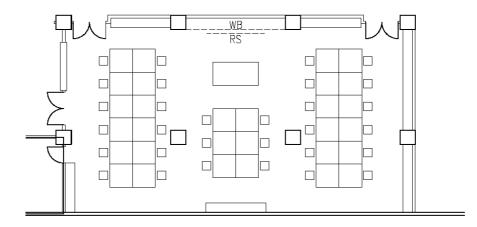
Informal and Communication Engineering Laboratory Floor Plan
